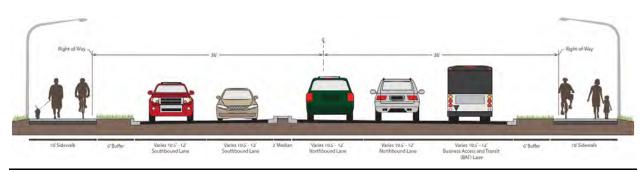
Proposed Typical Section – Callahan Drive to Hollis Street
